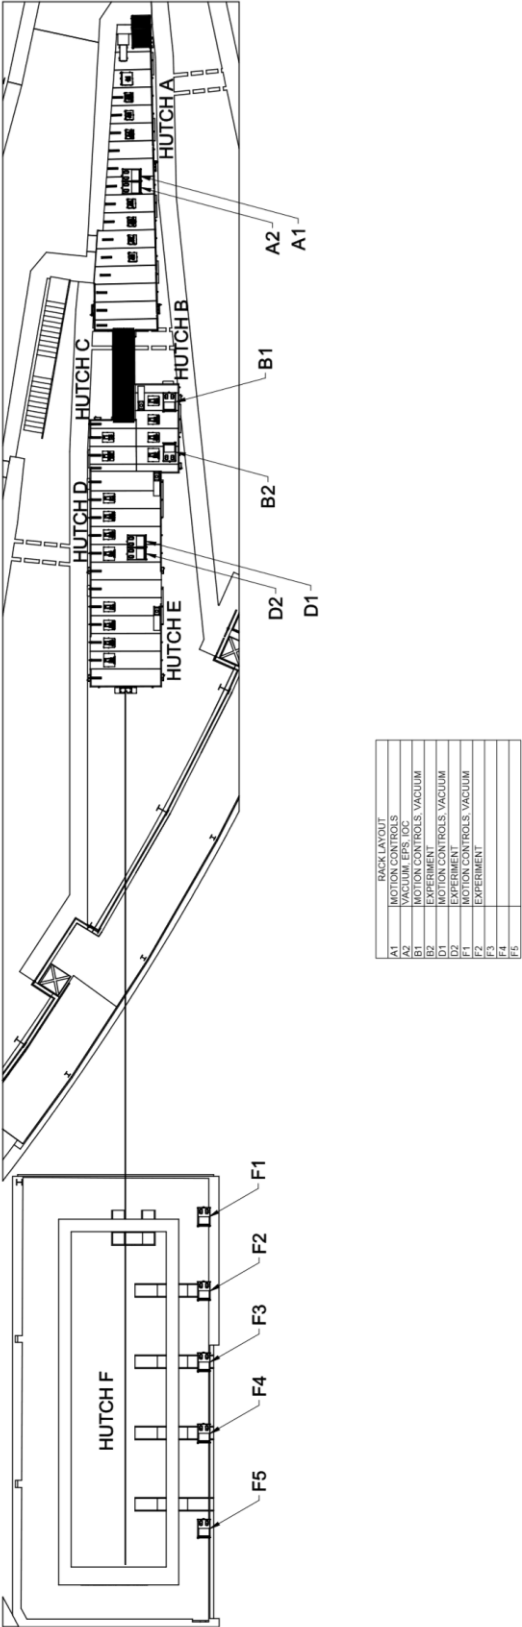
Layout of the furniture and equipment in the satellite building and outside the F-hutch
